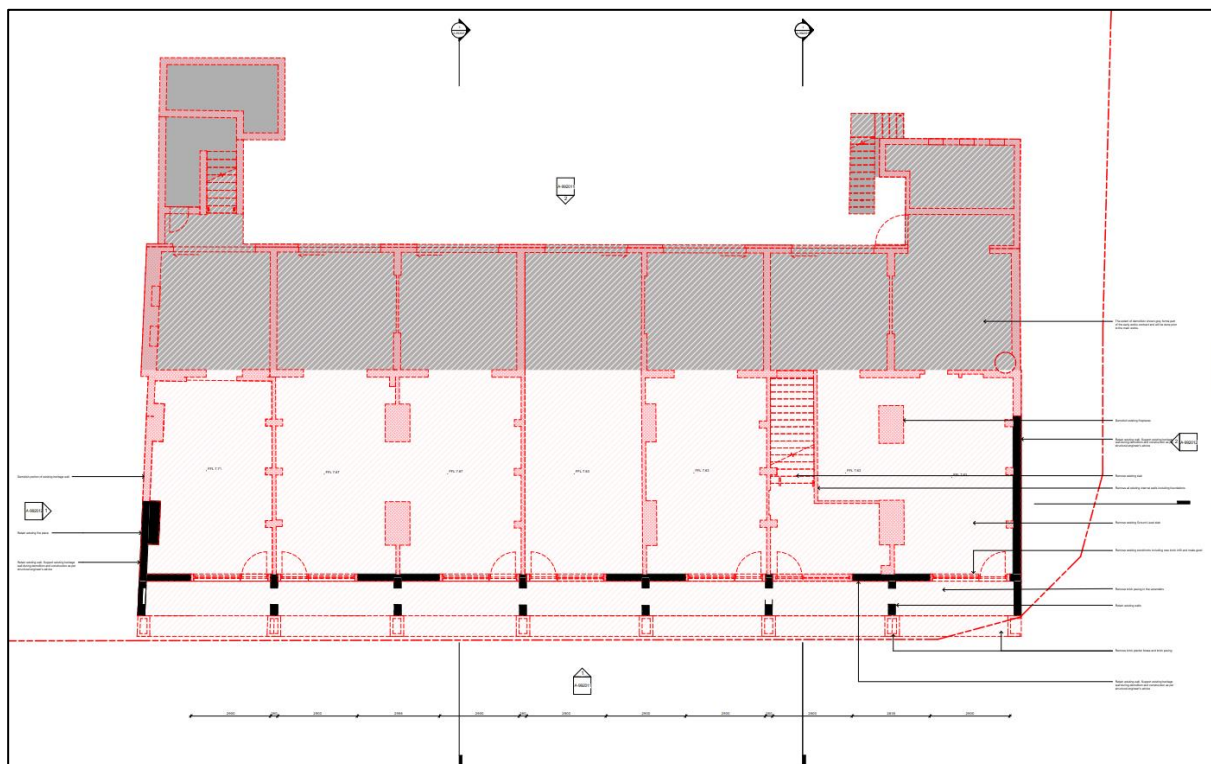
St George's Terrace ground floor demolition plan. The grey shaded area is the rear addition that was demolished as part of the early works contract in 2021 (Source: Genton, 2021).
